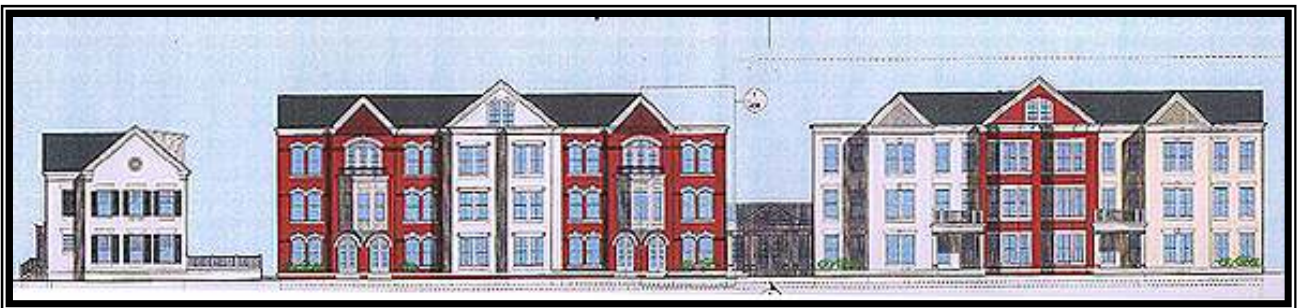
Proposed North Columbus Street elevation for Certificate of Appropriateness Review
